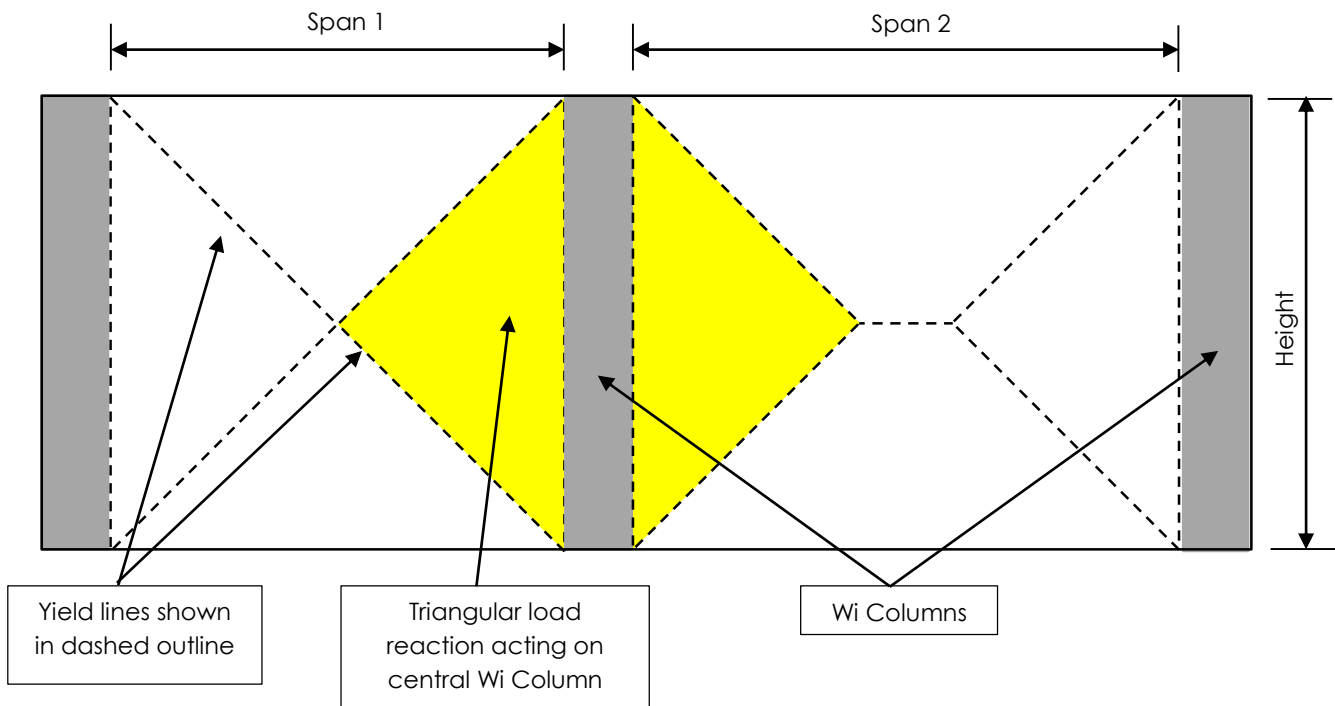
“Standard” Load acting on a Wi Column for $H \leq \text{Span}/2$
